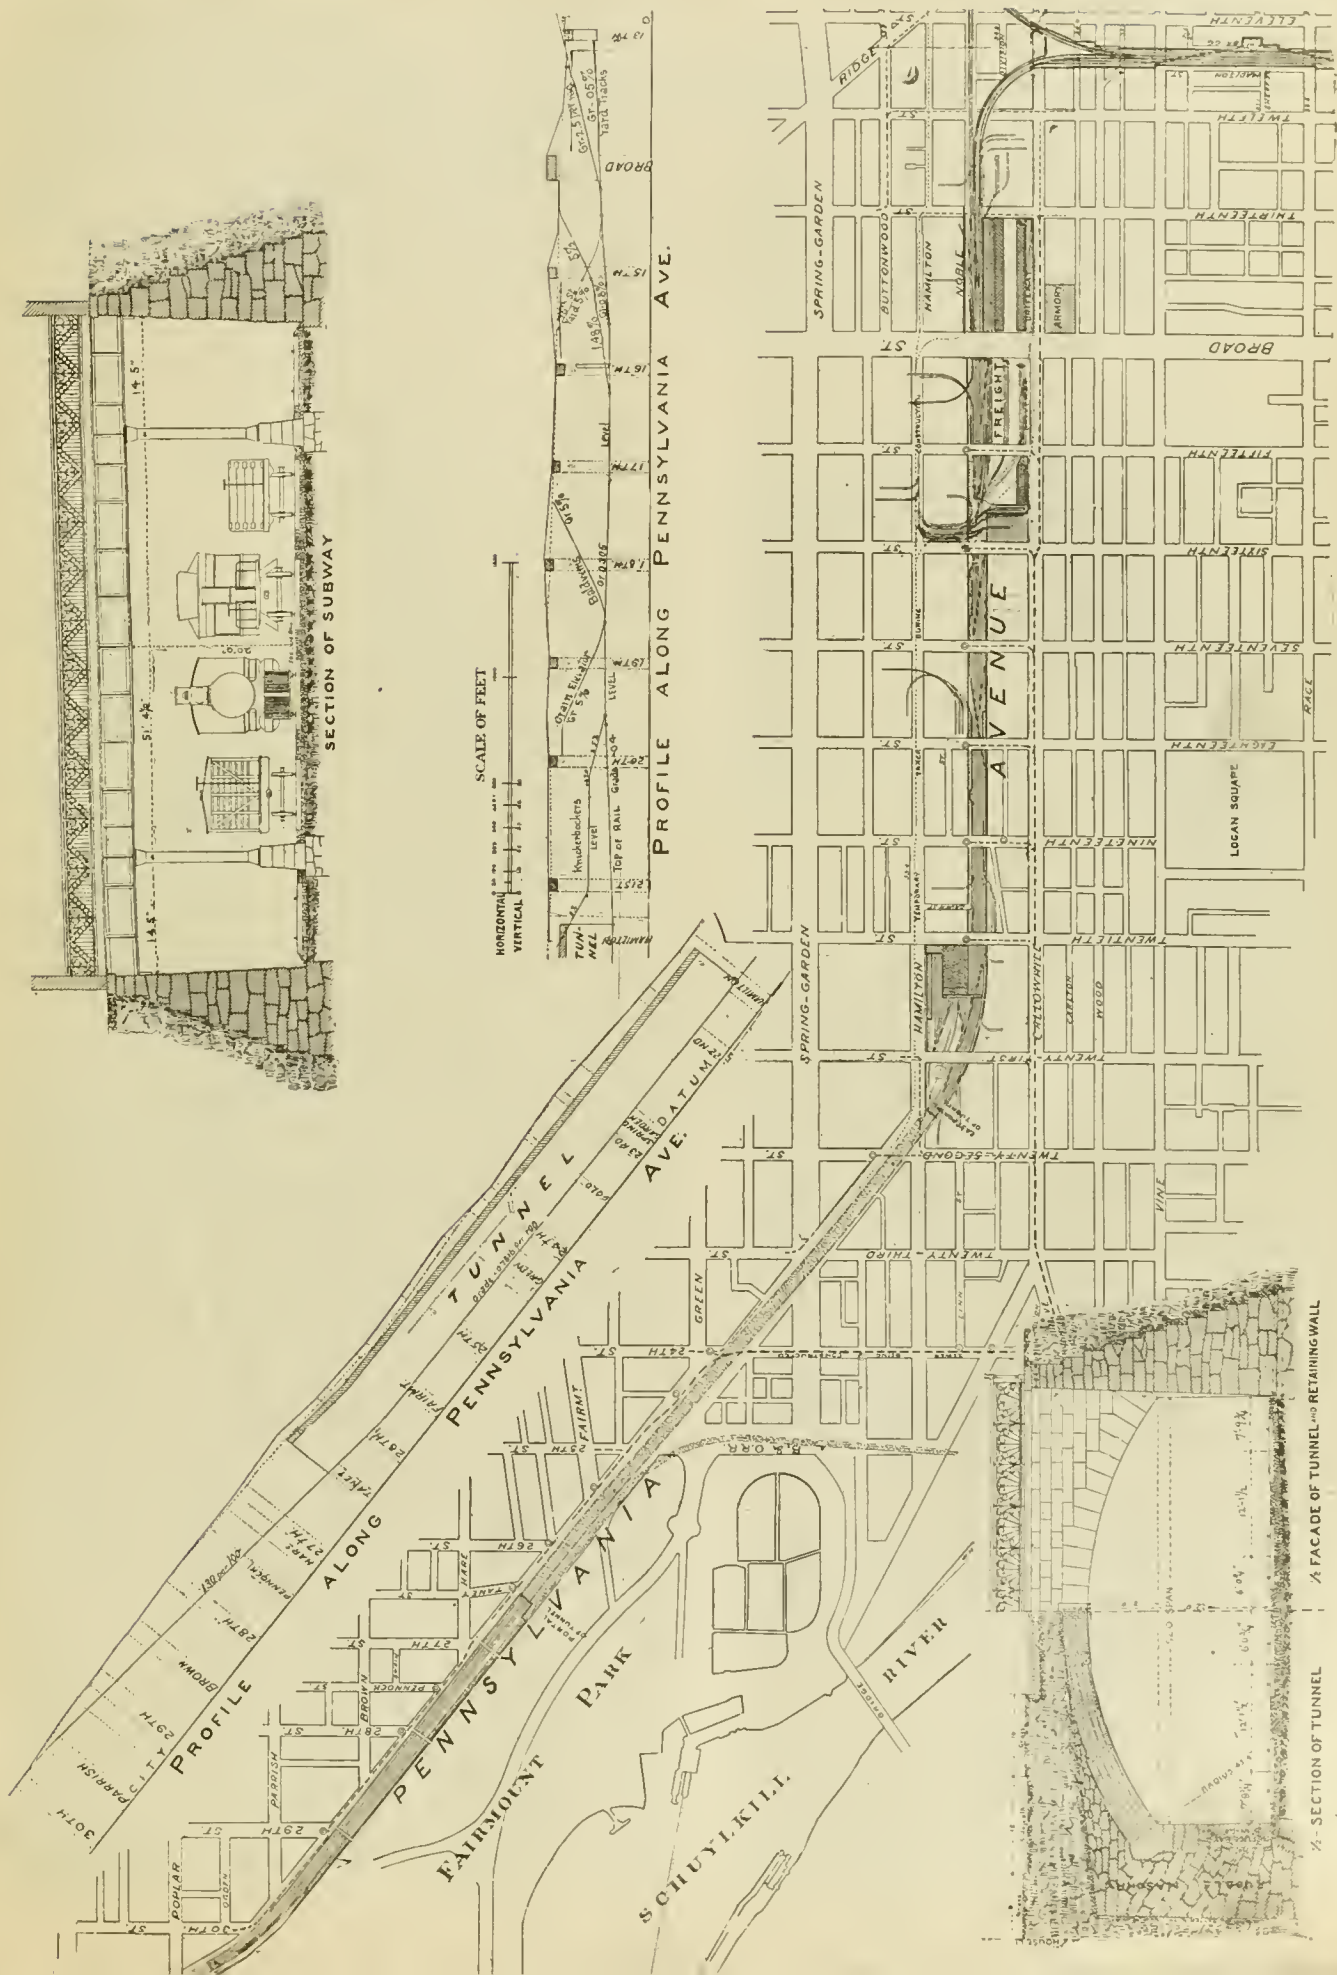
PLAN, PROFILE AND SECTIONS OF PENNSYLVANIA SUBWAY AND TUNNEL.
